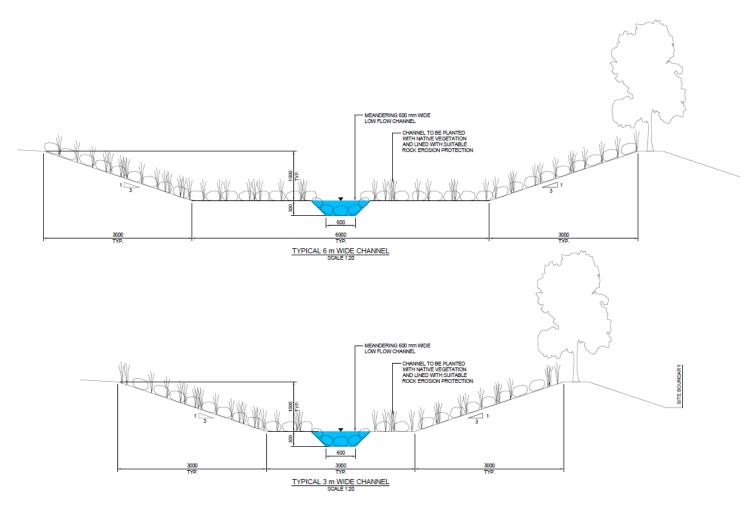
Cross-section of proposed overland flow channel (indicative and subject to detailed design)
